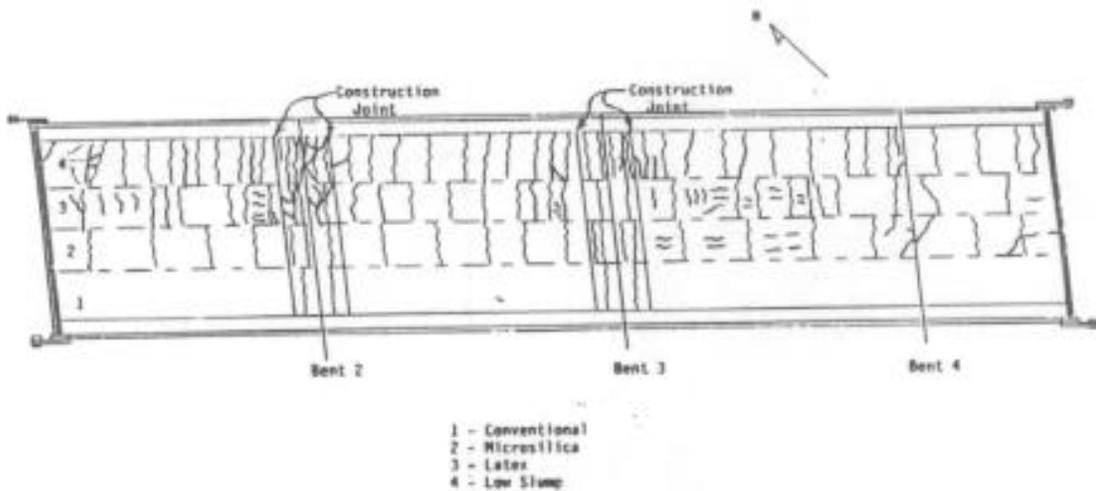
Overlay Cracks in Haynes Bridge Rd.
